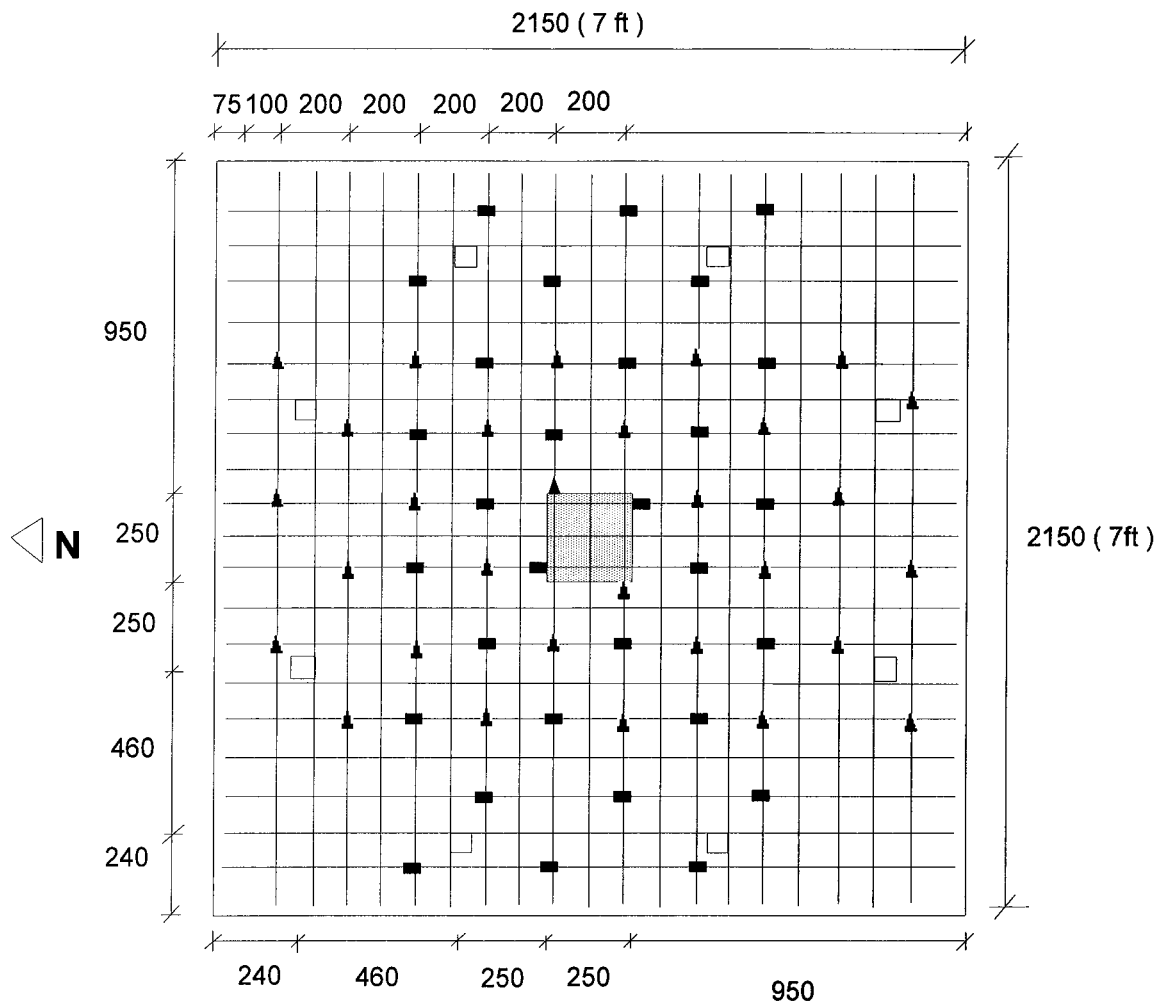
Top Reinforcement and Gauge Layout : Slab SR-1
